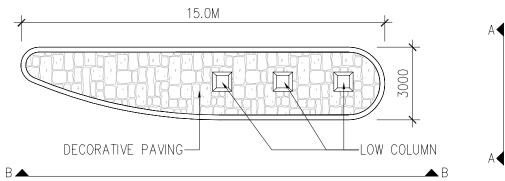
Concept Plan of Typical Executive Gateway Feature
